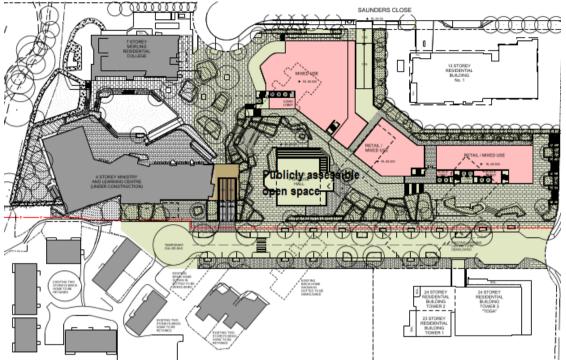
Scenario 5 – Construction of Buildings 1 & 2 with Road 3 three quarter completed.
